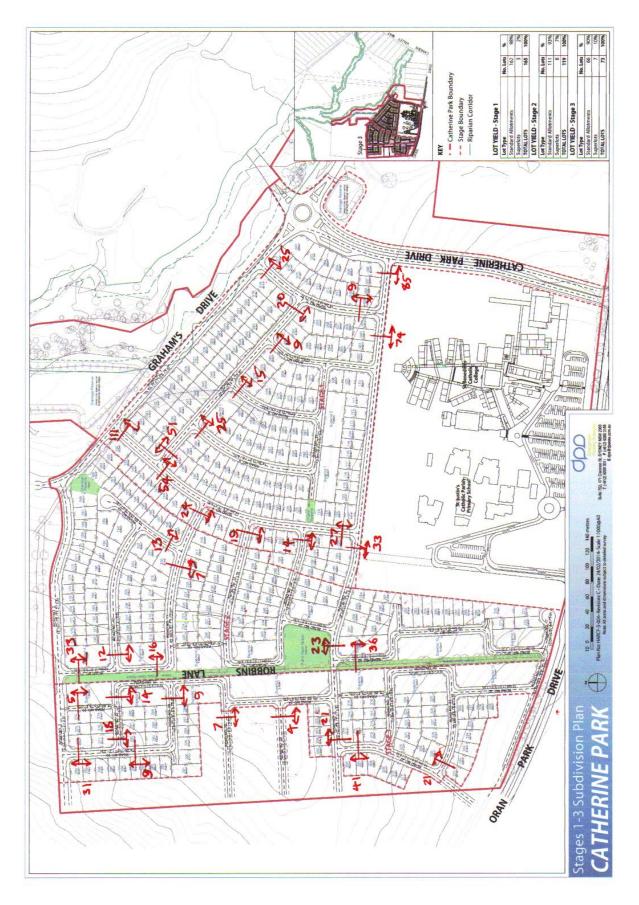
STAGES 1-3 SUBDIVISION PLAN and TRAFFIC FLOWS
